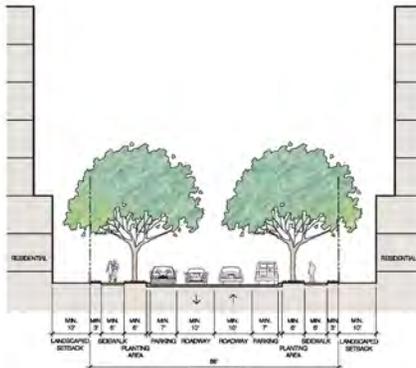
Neighborhood Street - Non Aerial Access
